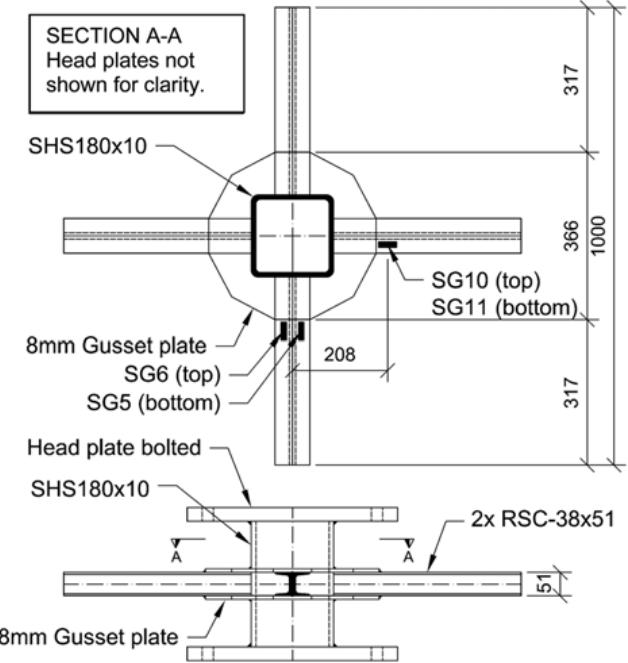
Shearhead detail proposed in [Eder et al. \(2011\)](#).
